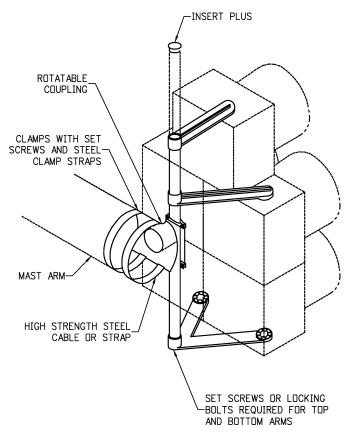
DETAIL OF MAST ARM MOUNTING FOR IN-LINE SIGNAL HEAD (3-SECTION, 4-SECTION OR 5-SECTION)
